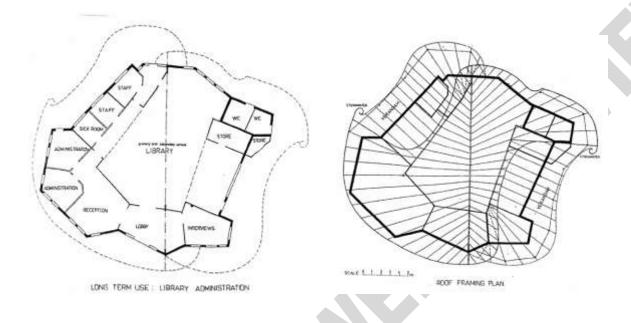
Library Floor Plan (left) and Roof Plan (right)
